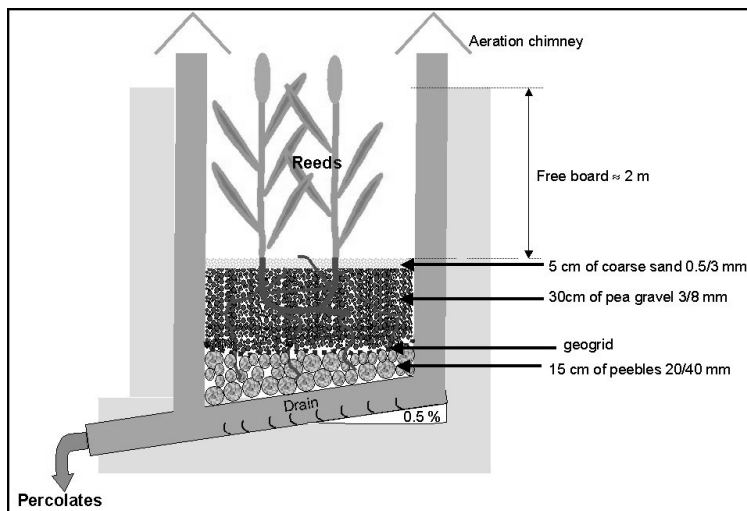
Schematic cross section of a planted sludge drying bed made in concrete (not at scale)
